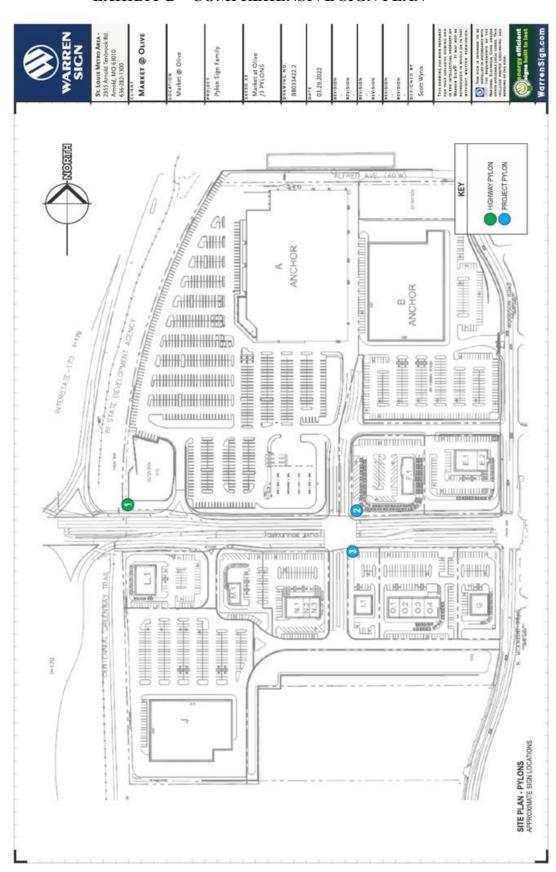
EXHIBIT B – COMPREHENSIVE SIGN PLAN
